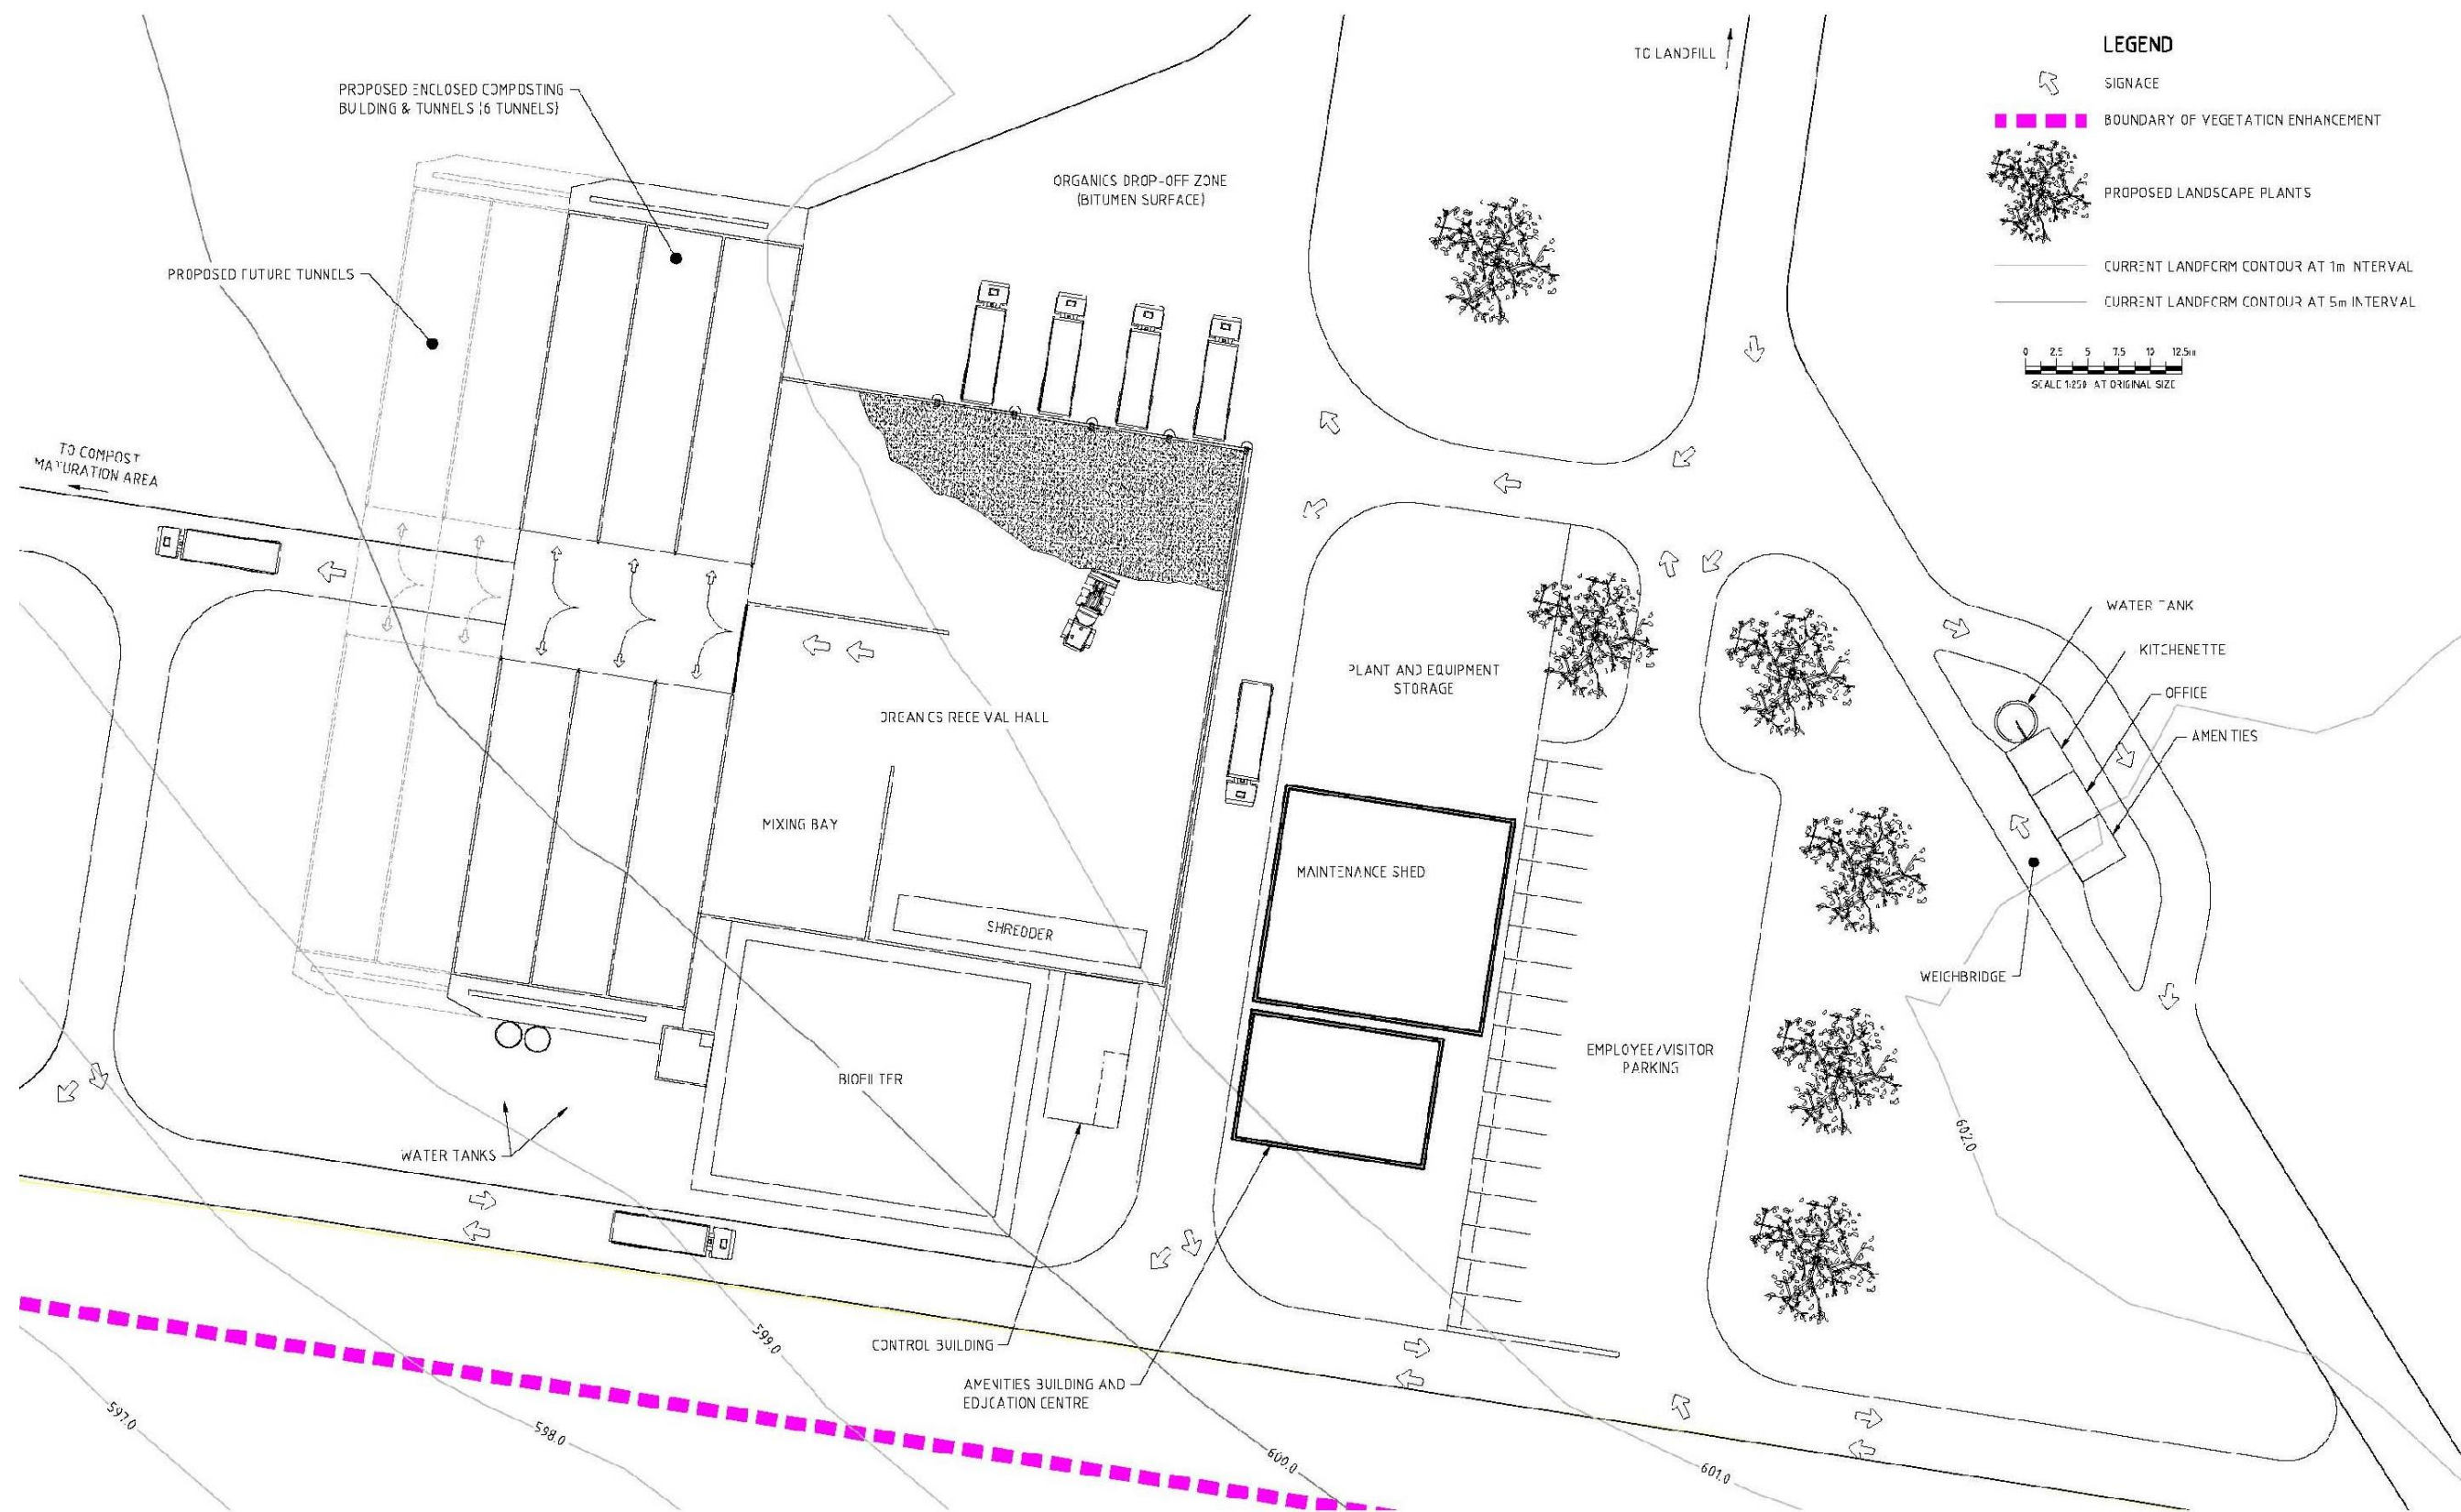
Conceptual enclosed tunnel composting plant (plan)
